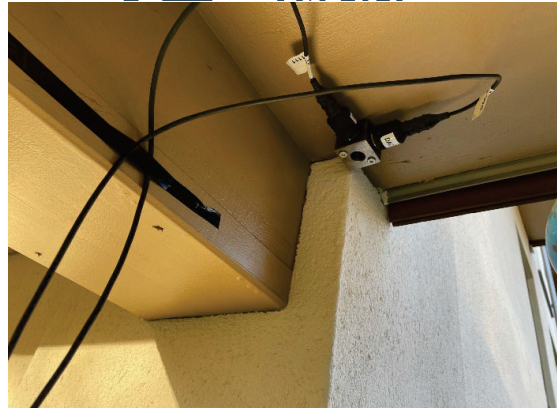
Two PCB-39 accelerometers positioned under a balcony at one of the corners of the building.
